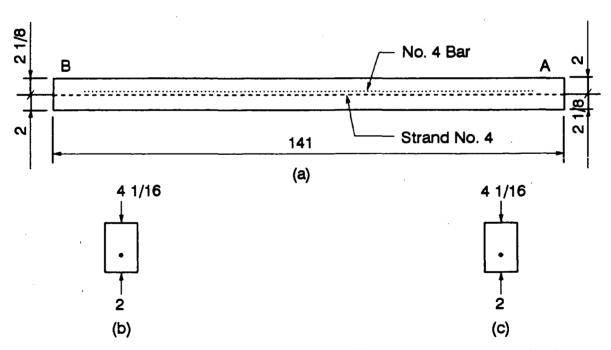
Specimen No. 10-6.0DU-4 (dimensions shown in inches):
